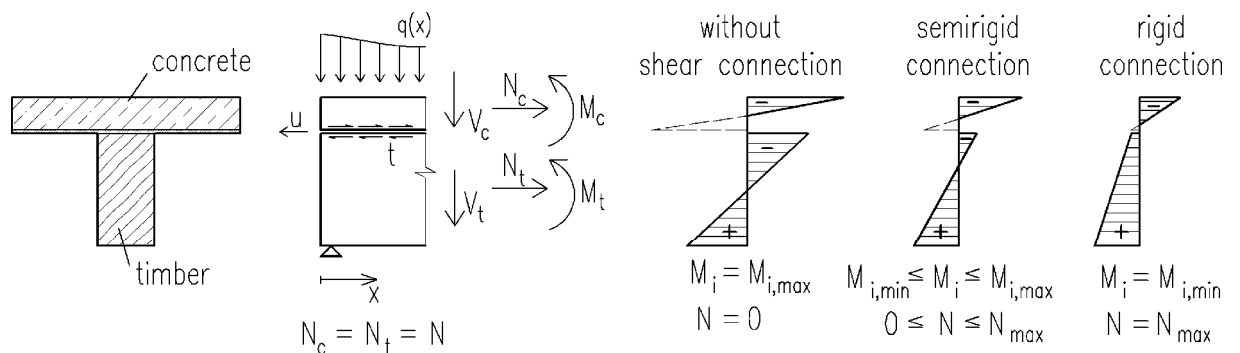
Stress distribution of a timber-concrete composite beam depending on the rigidity of the timber-concrete connection
